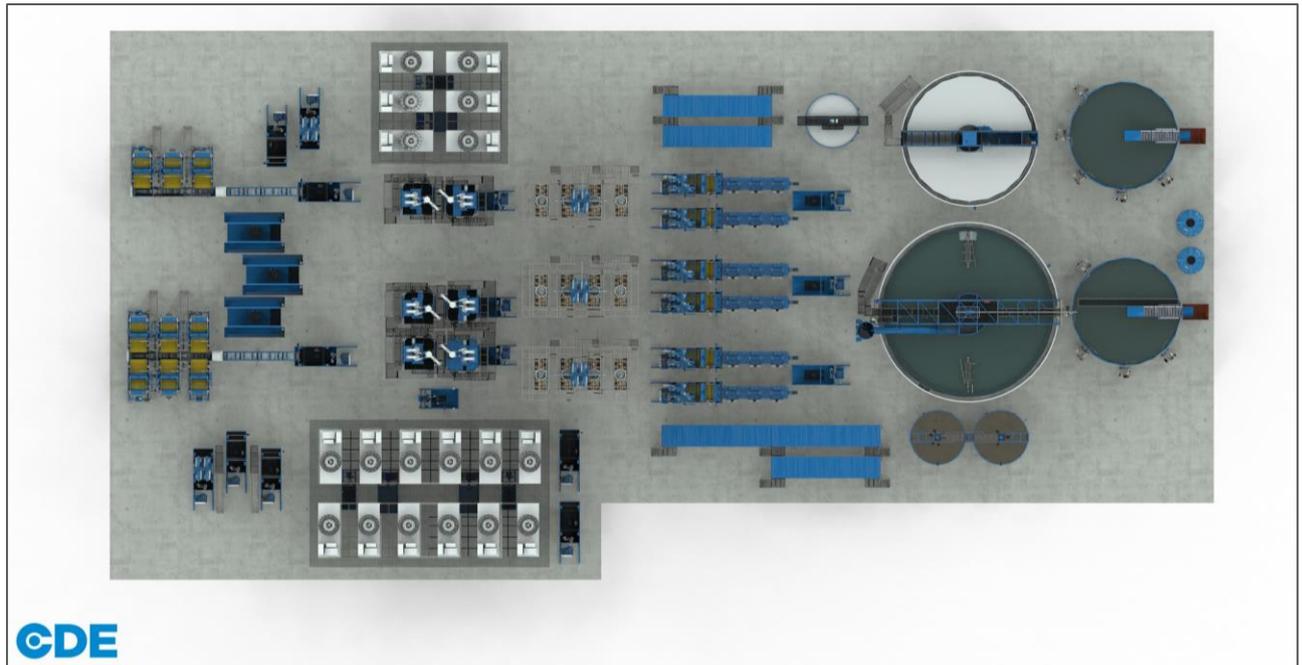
Proposed NSP 5 Mtpa Processing Plant Layout
